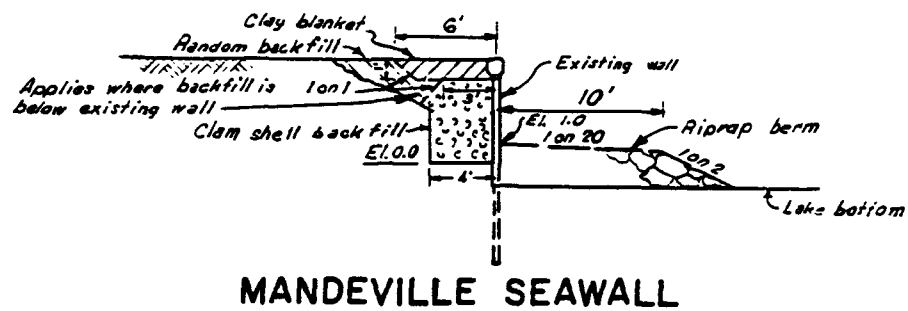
Cross-section of Mandeville seawall (US Army Corps of Engineers 1962).
